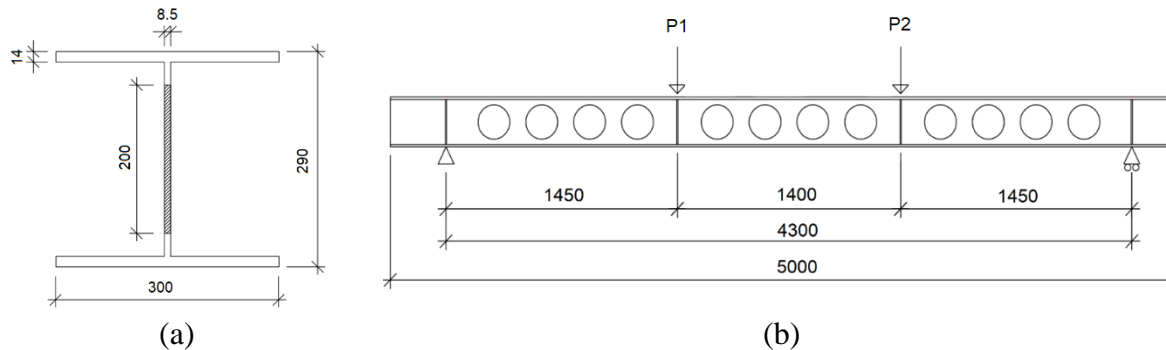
Schematic of the stainless steel cellular beam [36] (all dimensions are in mm) including (a) the cross-section and (b) an elevation view
